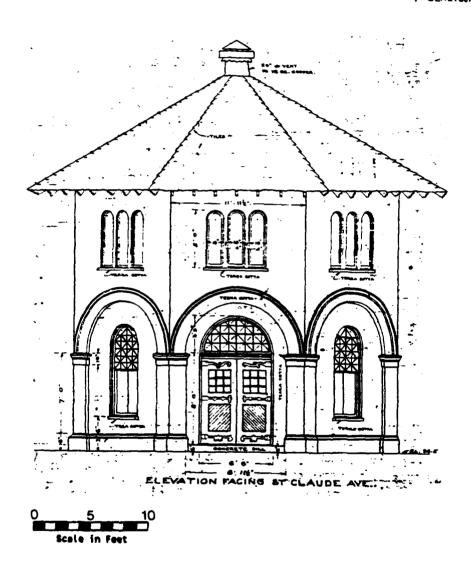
A 1904 drawing showing the elevation of Station B facing St. Claude Avenue (reproduced from Drawing No. 1031-A-10, Sewerage and Water Board files).
